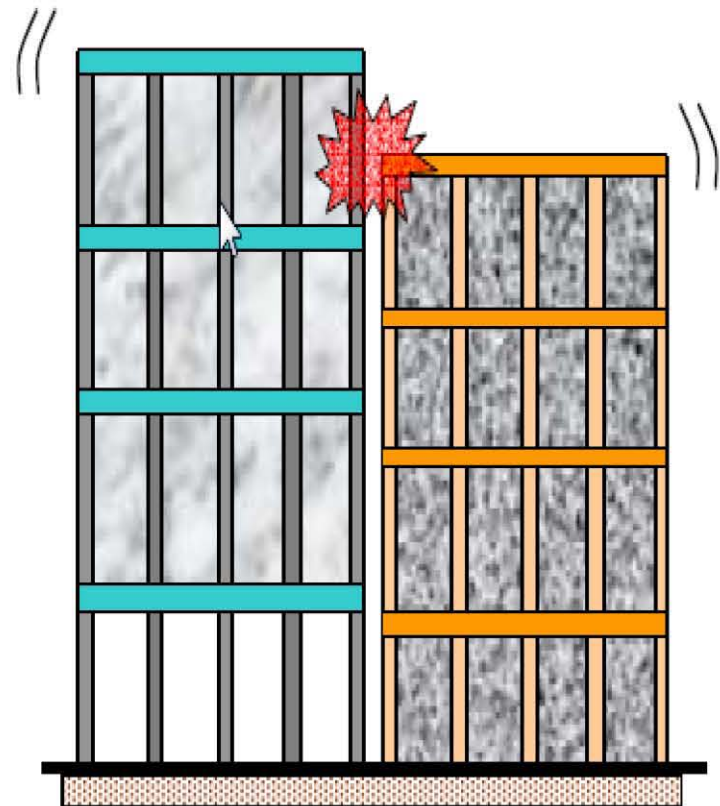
Pounding can occur between adjoining buildings due to horizontal vibrations of the two buildings.
